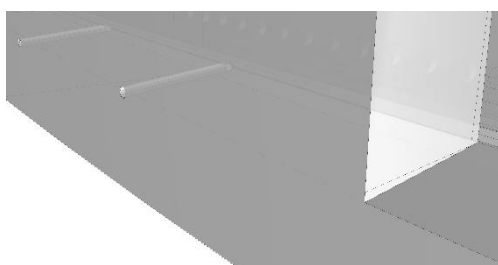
Bottom ventilation holes connecting the cavity with the outside
